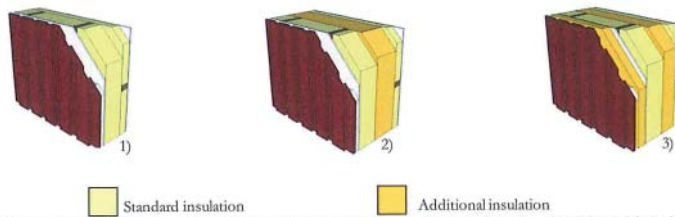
Alternative 1 - Standard wall constructions. Alternative 2 – Additional insulation on the interior side of the wood frame construction. Alternative 3 – Additional insulation on the exterior and interior side of wood frame construction
